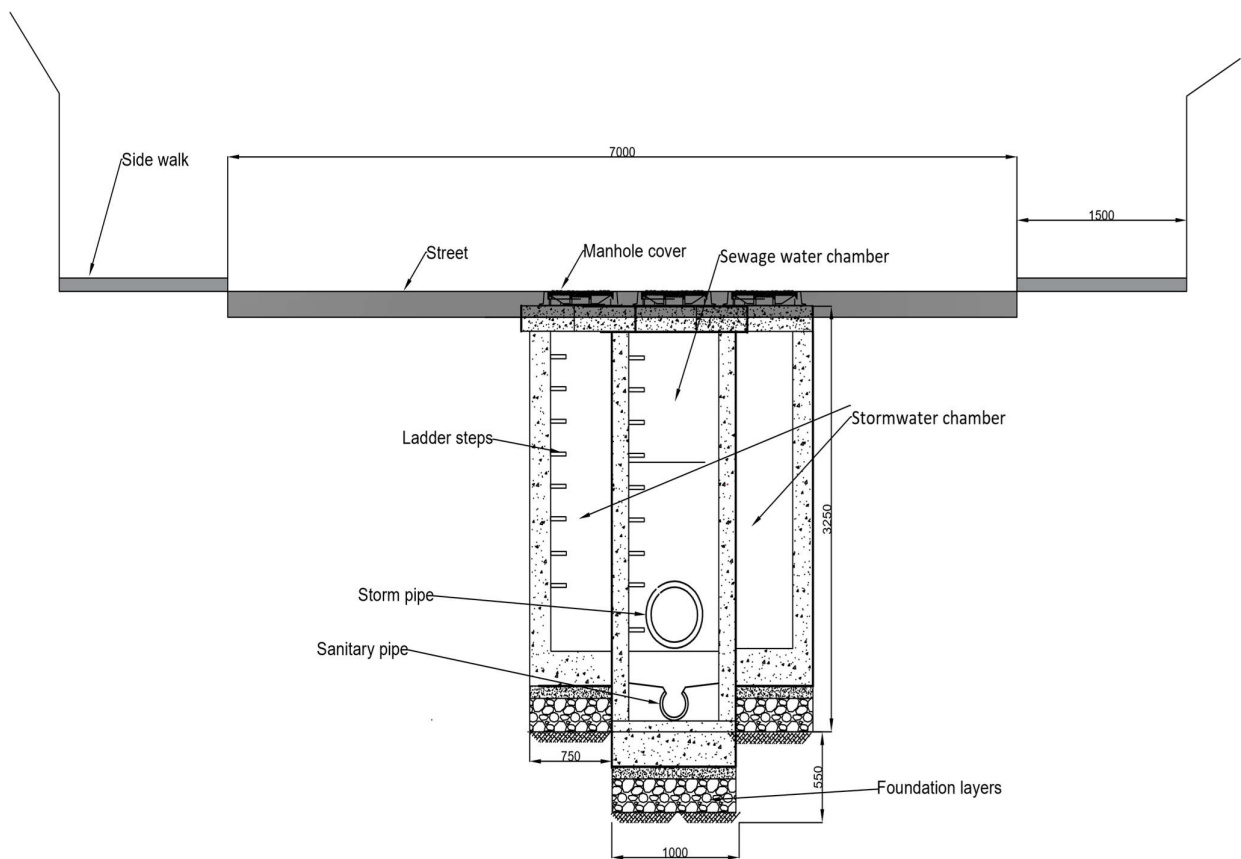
Cross section of the new manhole located in a separate sewer system in the street.
